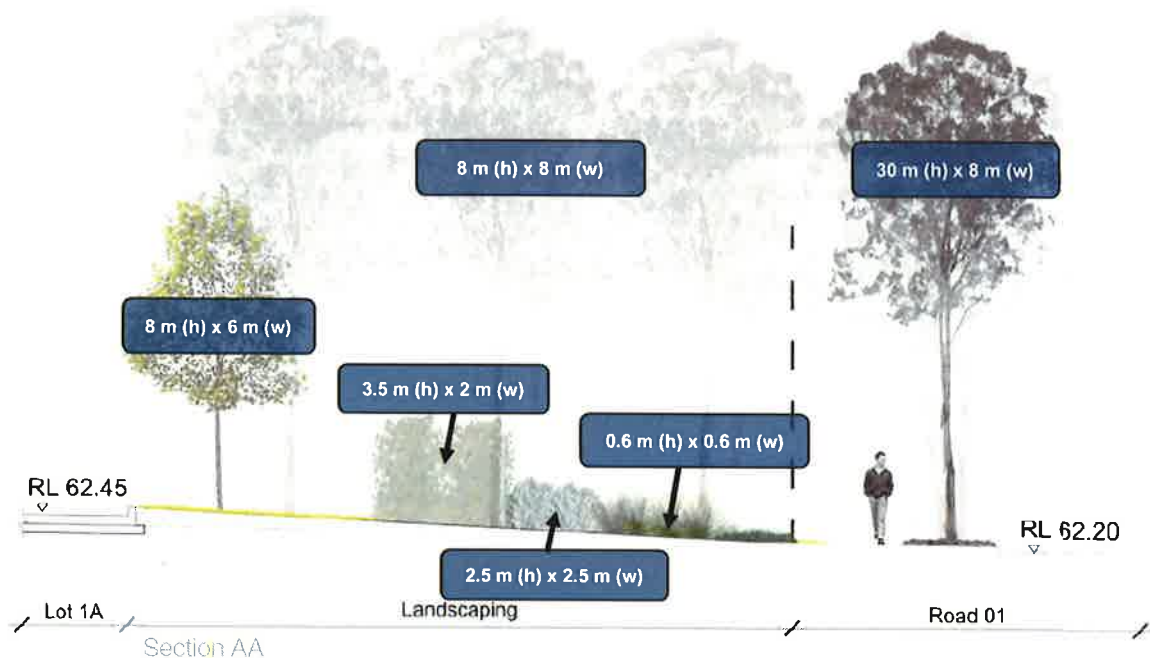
Section of Proposed Landscaping Between Lot 1A and Estate Road 01
